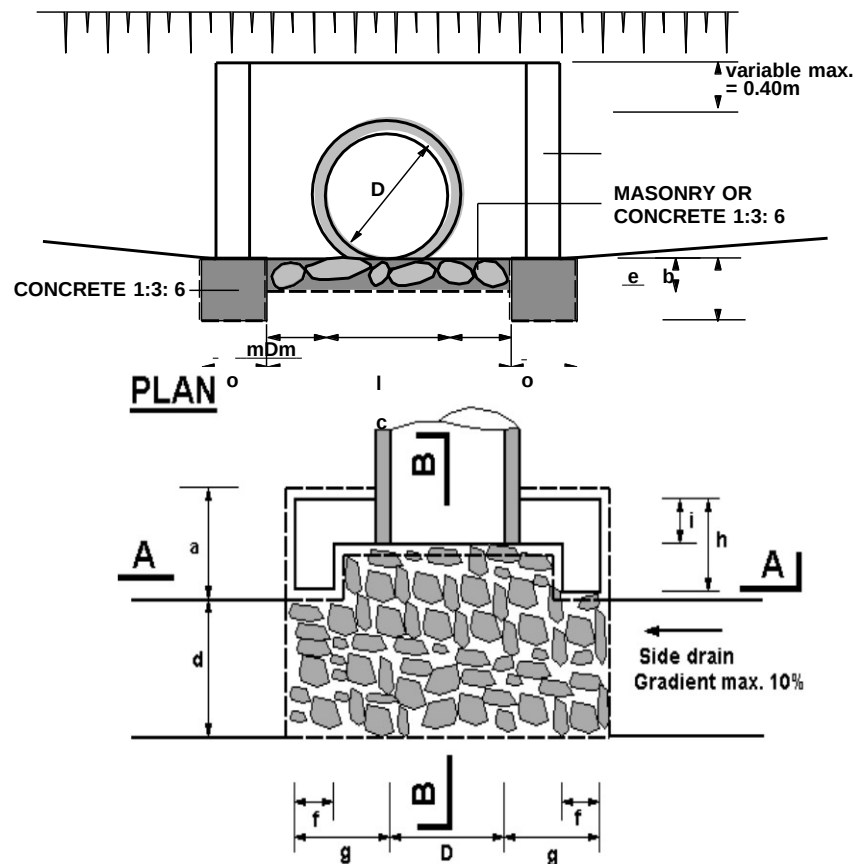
HEADWALL TYPE 3A (CONCRETE BLOCK HEADWALLS)
